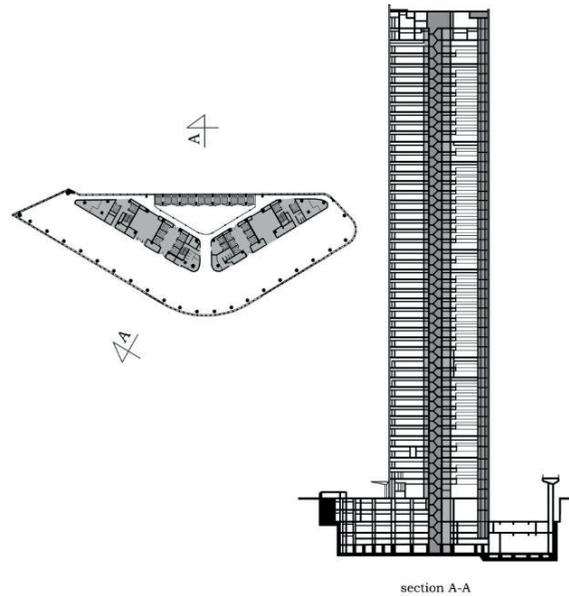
Dentsu Tower: floor plan and section, developed by authors [15]
